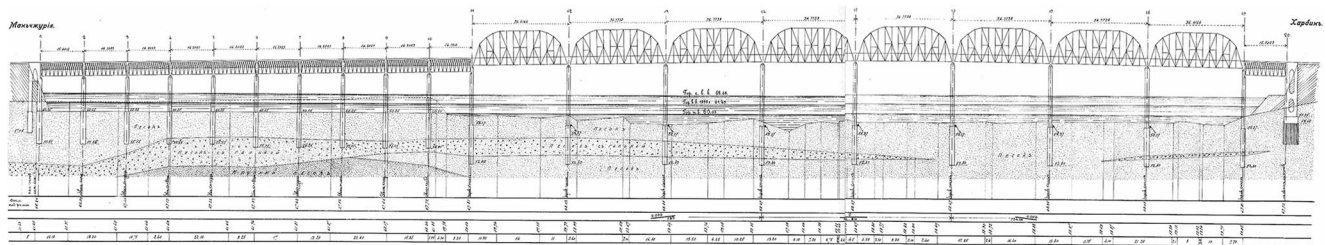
Initial elevation design of the First Songhua River Bridge, showing the elevation of pier and abutment foundations as well as hydrogeological information (Chinese Eastern Railway 1902).
